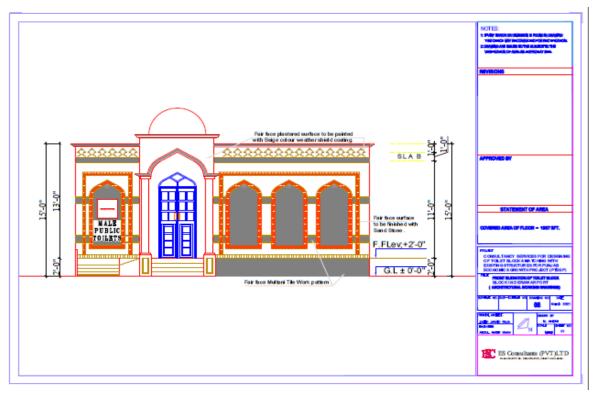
Front Elevation of the proposed toilet block at Derawar Fort
